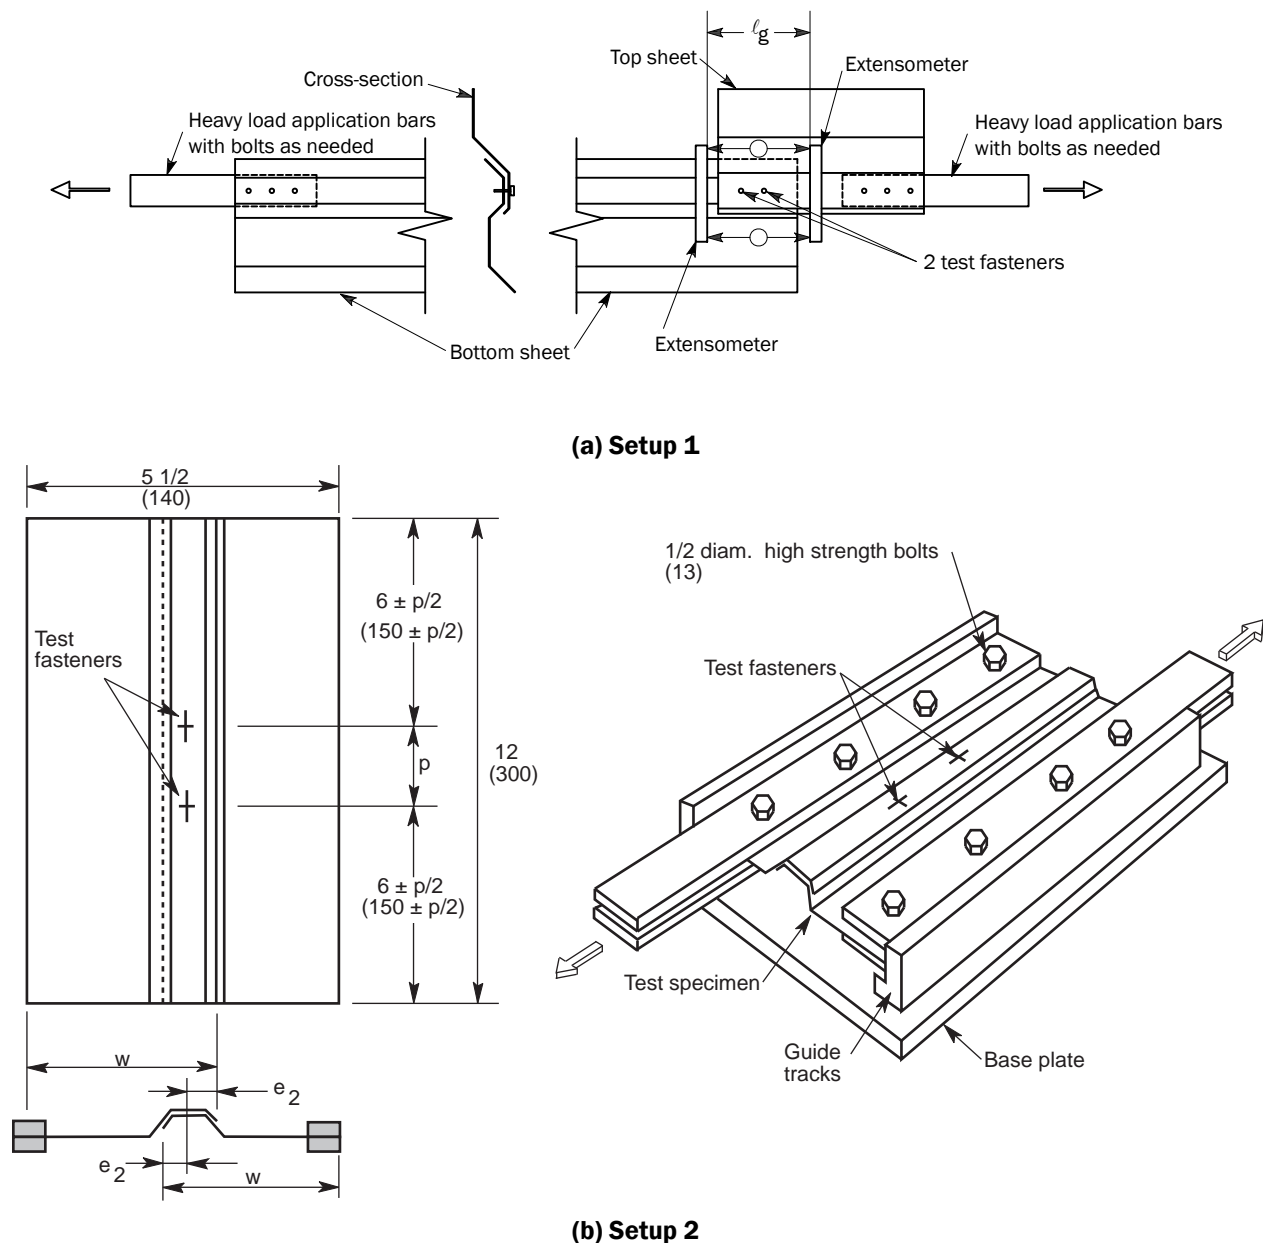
Alternative Lap-Joint Shear Test, units - in. (mm)
